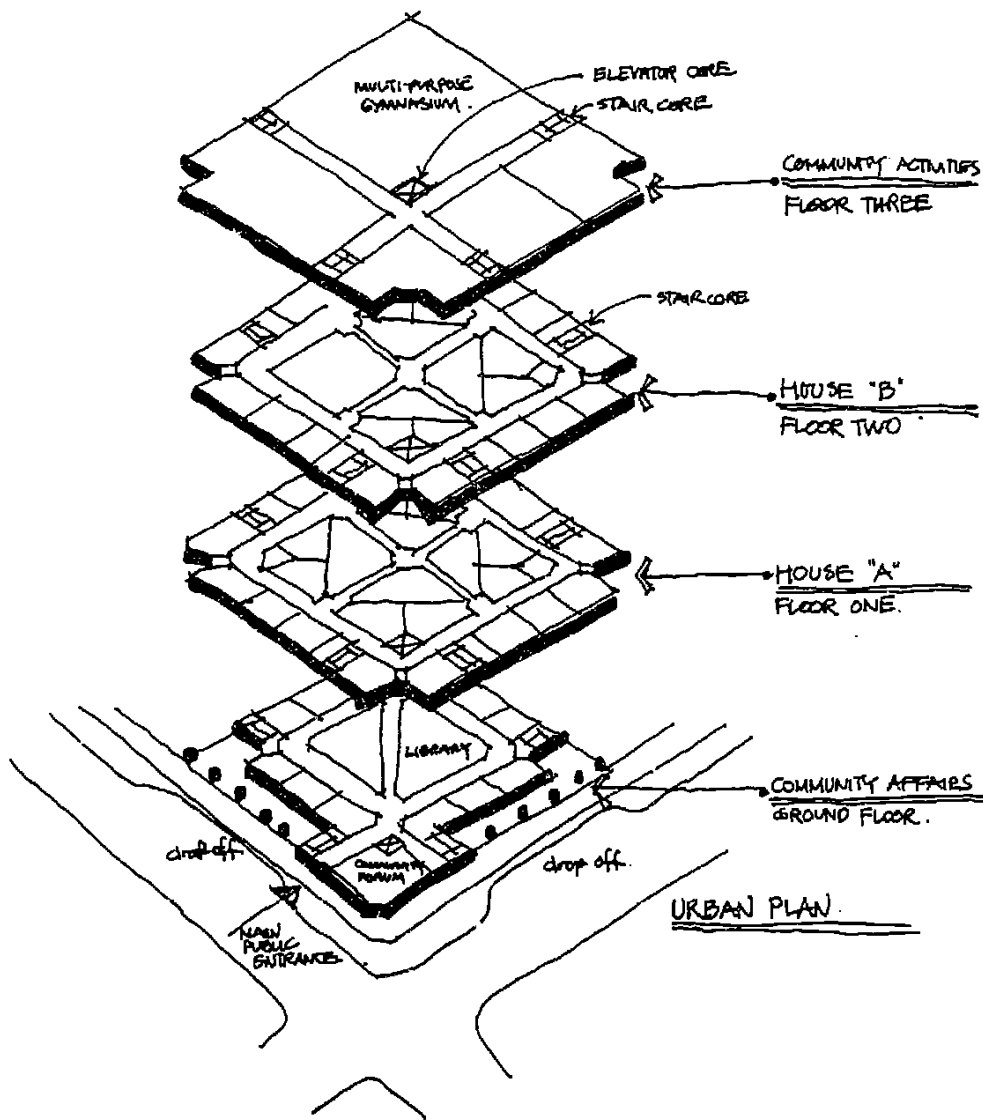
Campus plan--Alternative 2: Stacked plan.
